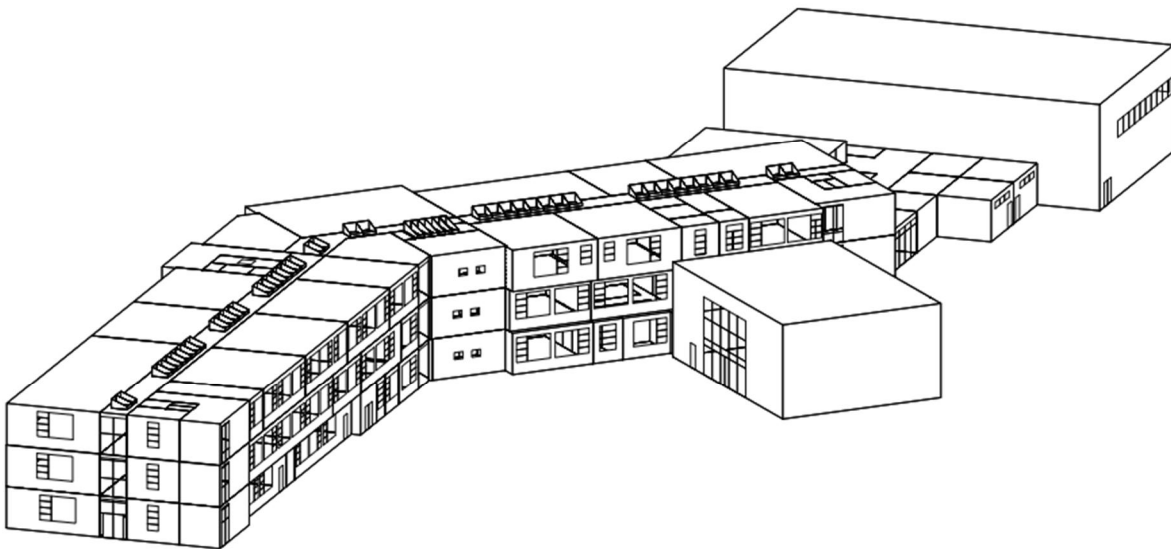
Rear Elevation of Heathside Elmbridge School 3D Model
